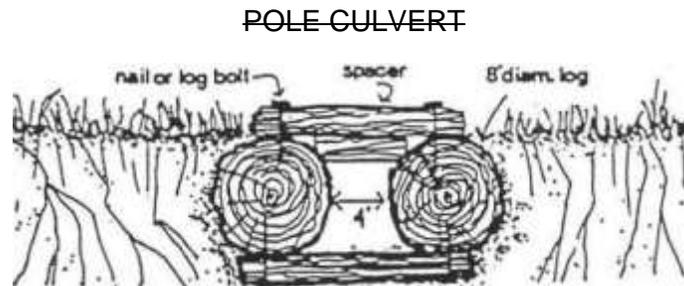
Proper Construction of Pole Culverts on Logging Roads.
